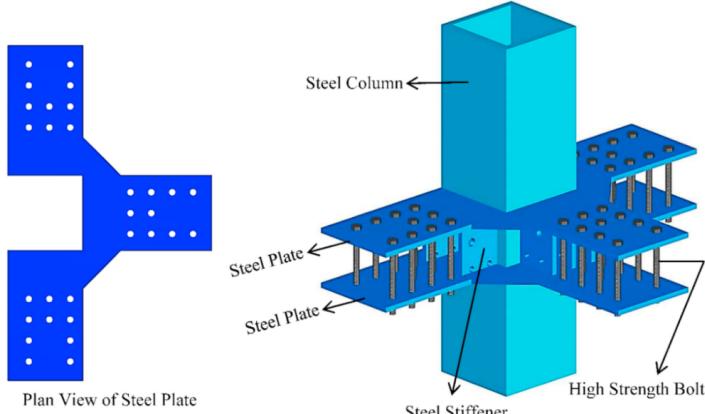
Propose flat slab to steel column connection configuration([Rafiee et al., 2021](#)).
